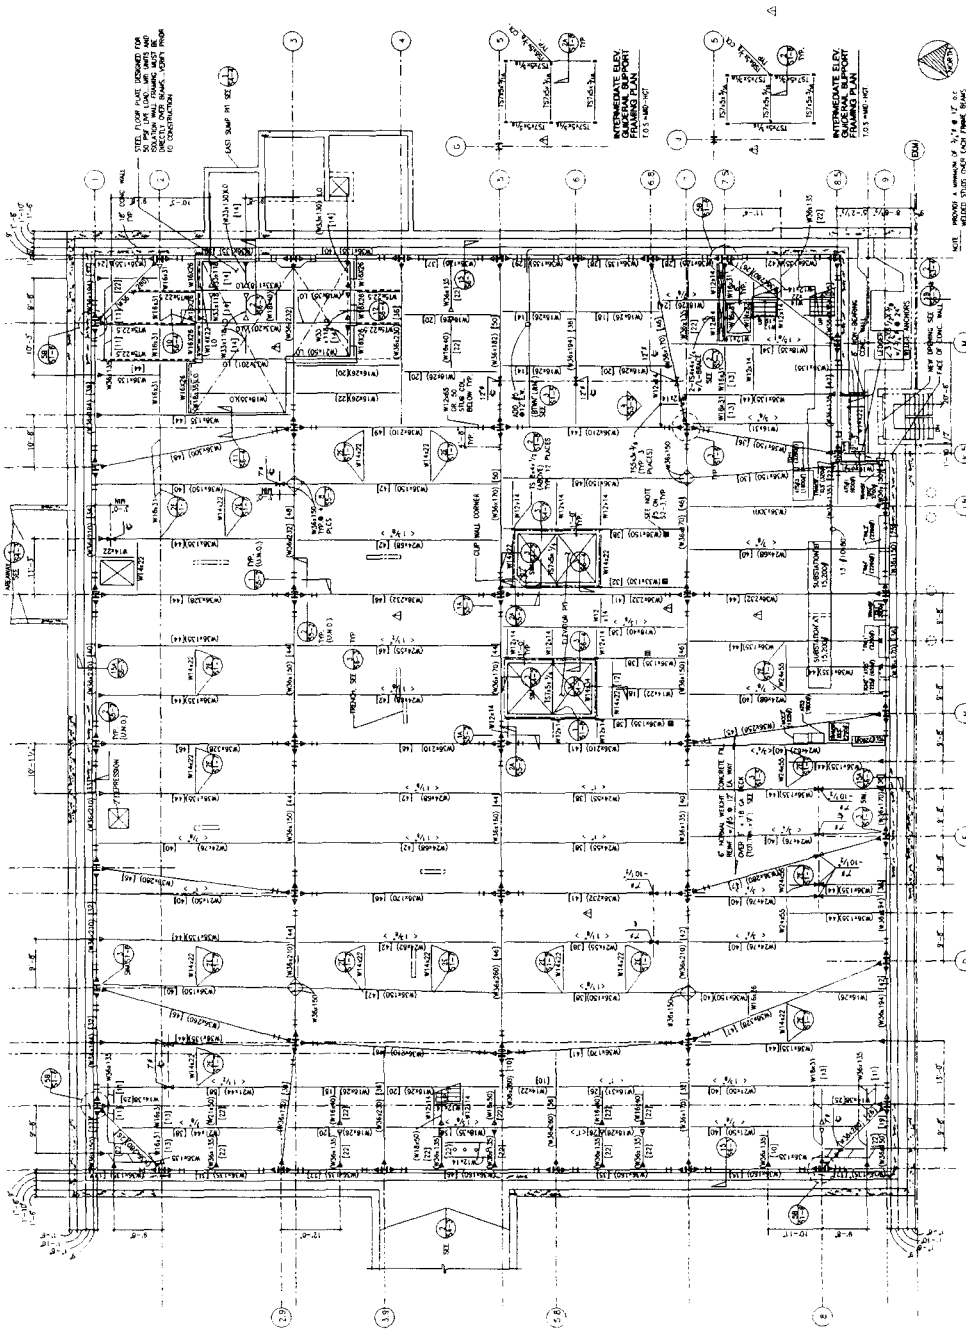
Floor plan for the diaphragm immediately above the isolation plane
